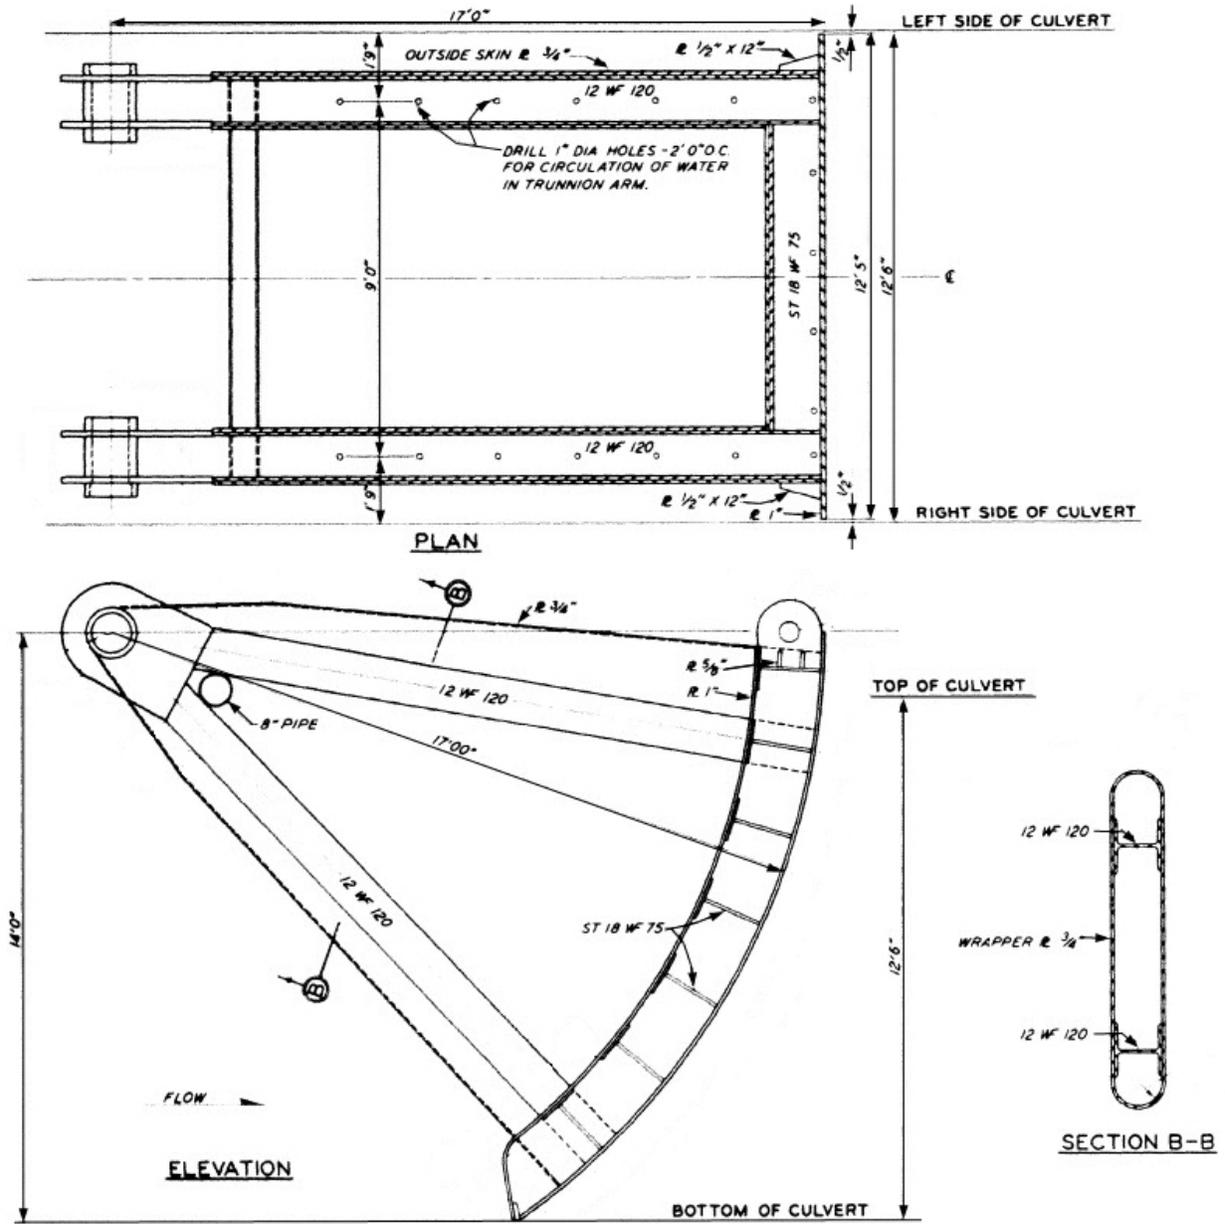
Tainter Valve, Holt Lock, Type 7 Design.
